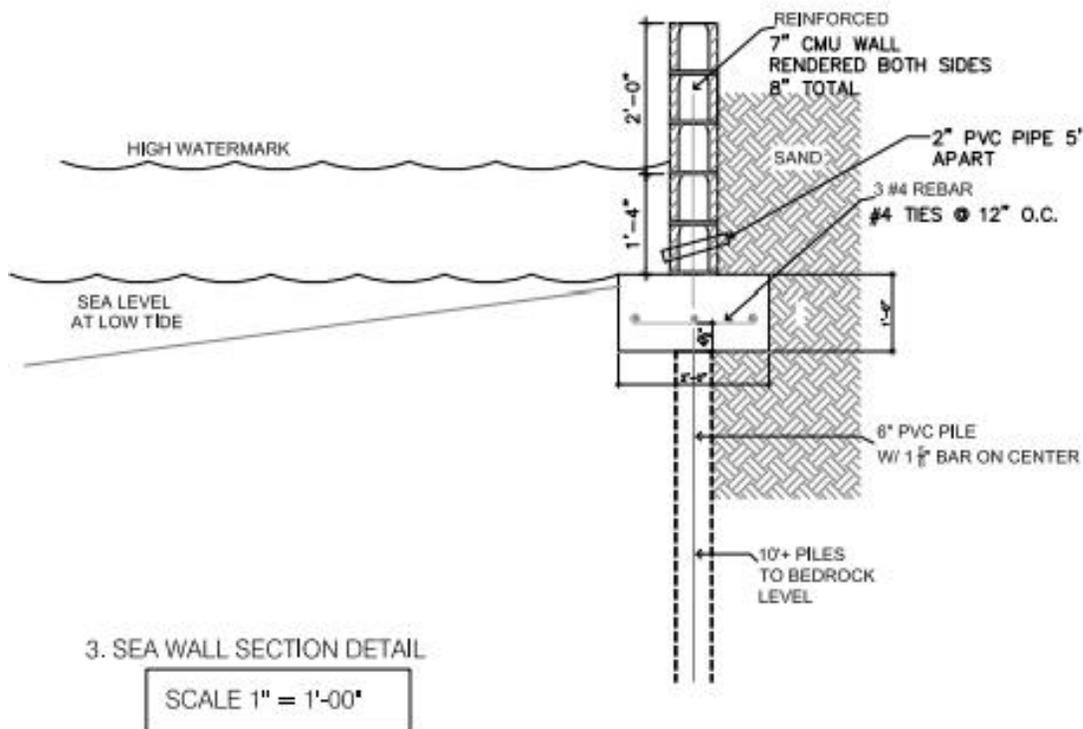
EXTRACT FROM APPLICANT'S SUBMISSIONS SHOWING THE CROSS SECTION OF THE PROPOSED SEA WALL. (SOURCE: ARCO, 10 OCTOBER, 2021)
